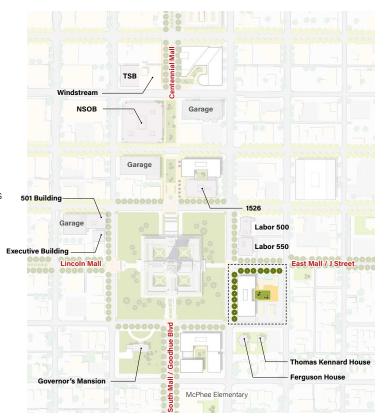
Illustrative view showing 1604 New Office Building
